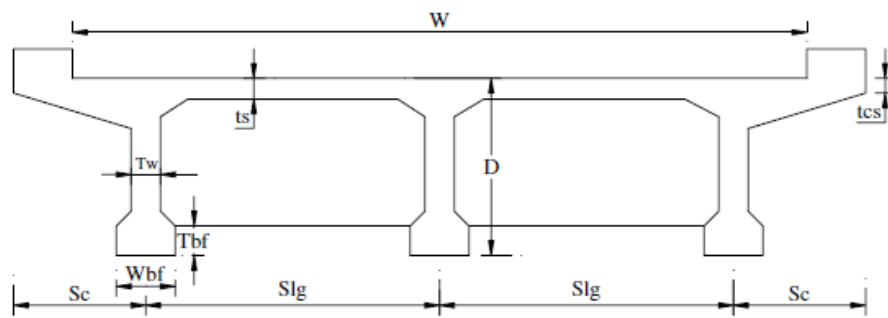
Typical cross-section of T-girder bridge deck (*Sriniva and Ramanjaneyulu, 2007*)
